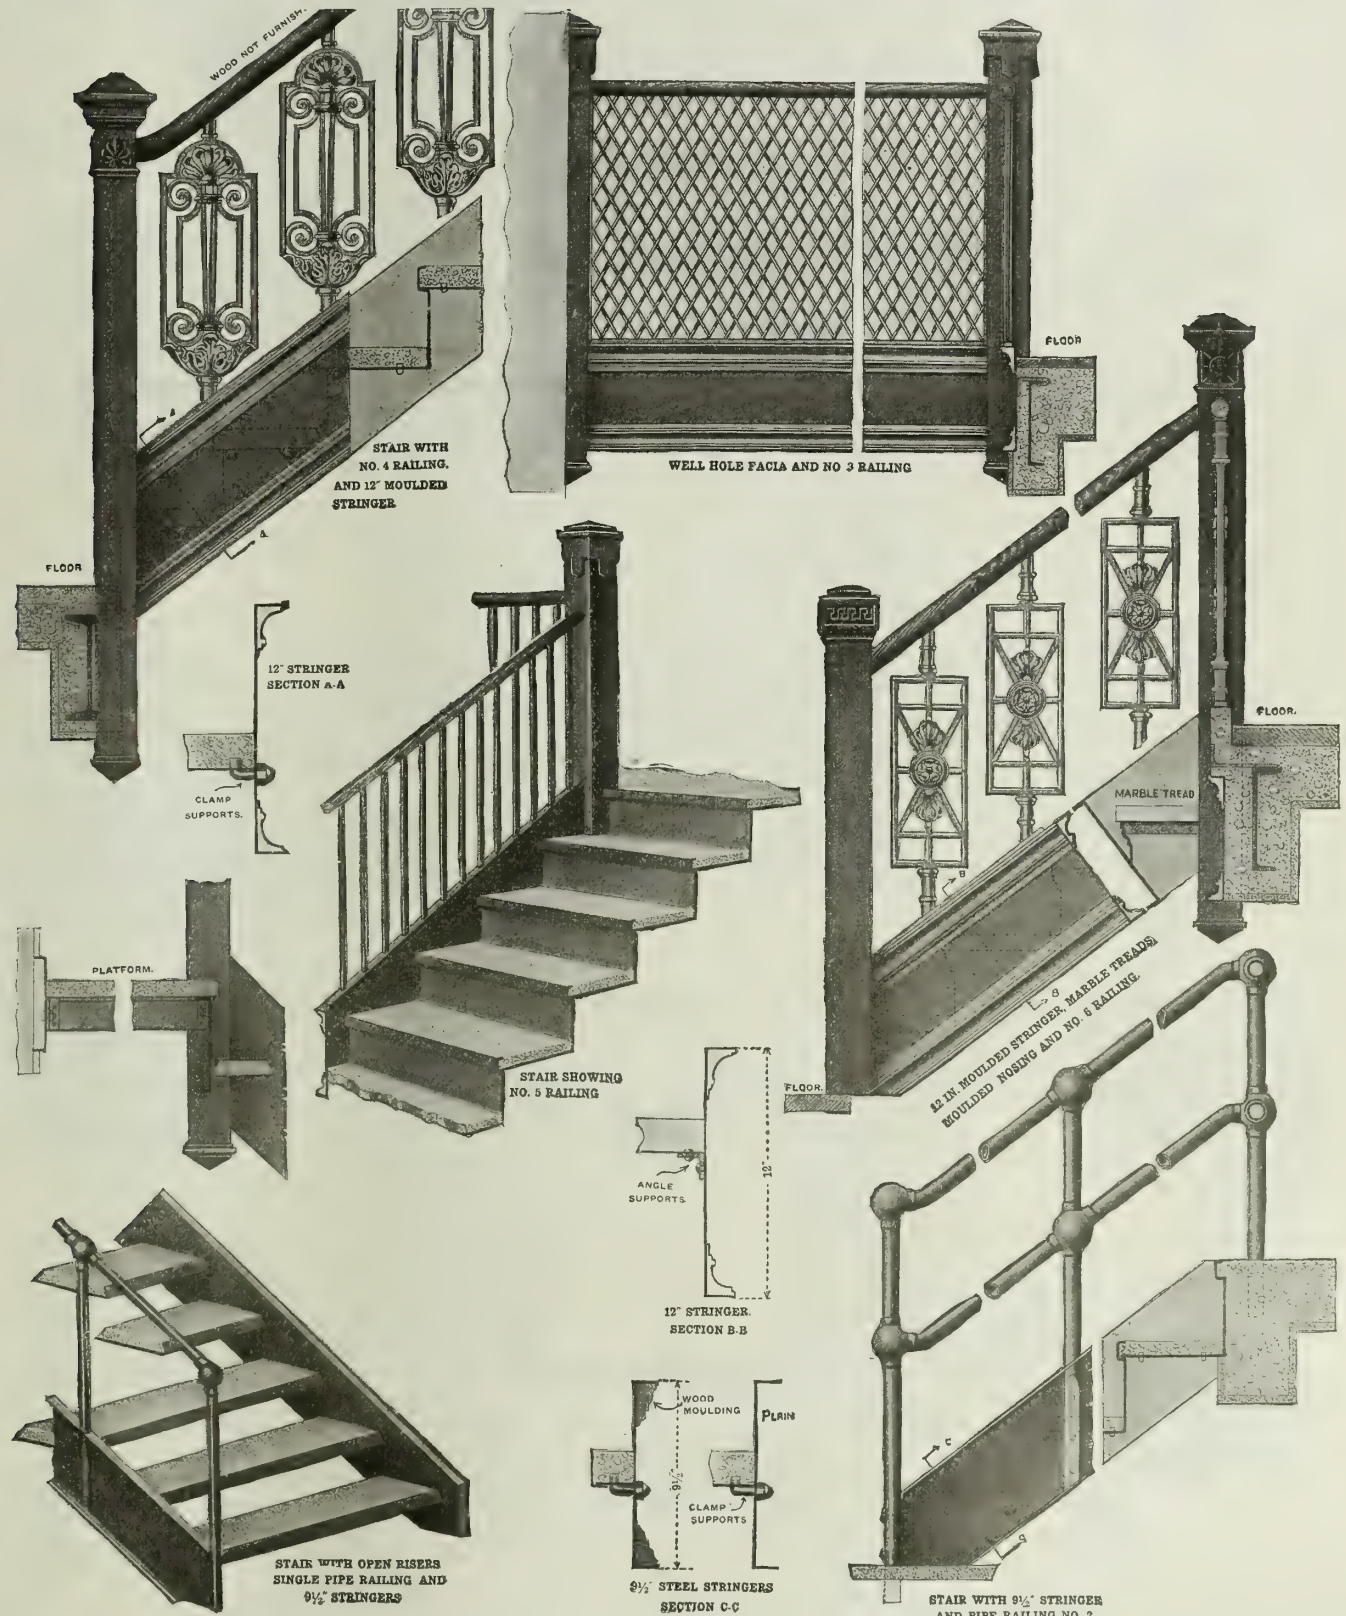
DETAILS OF MESKER PATENT STEEL AND CONCRETE STAIRS
